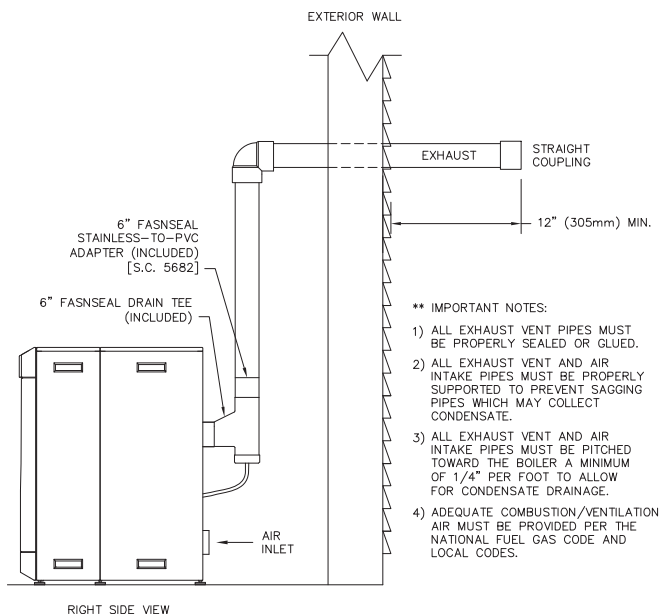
Sidewall Exhaust Vent with Indoor Air
